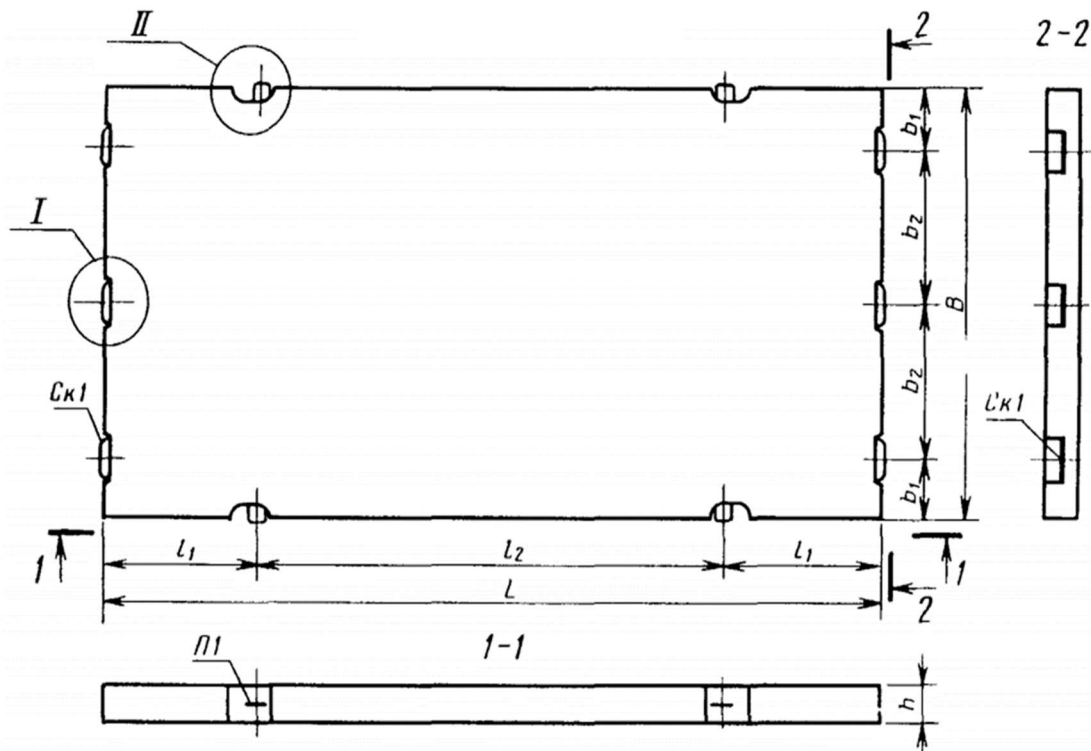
Prefabricated reinforced concrete slabs of brands P60.38, P60.35, P60.30
